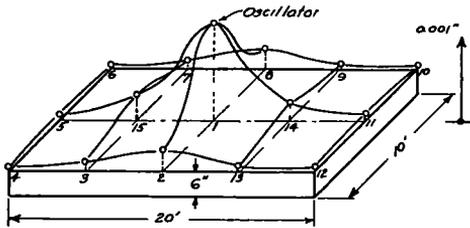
Maximum Deformation of 6-In Concrete Slab Under Dynamic Load in Center of Plate
